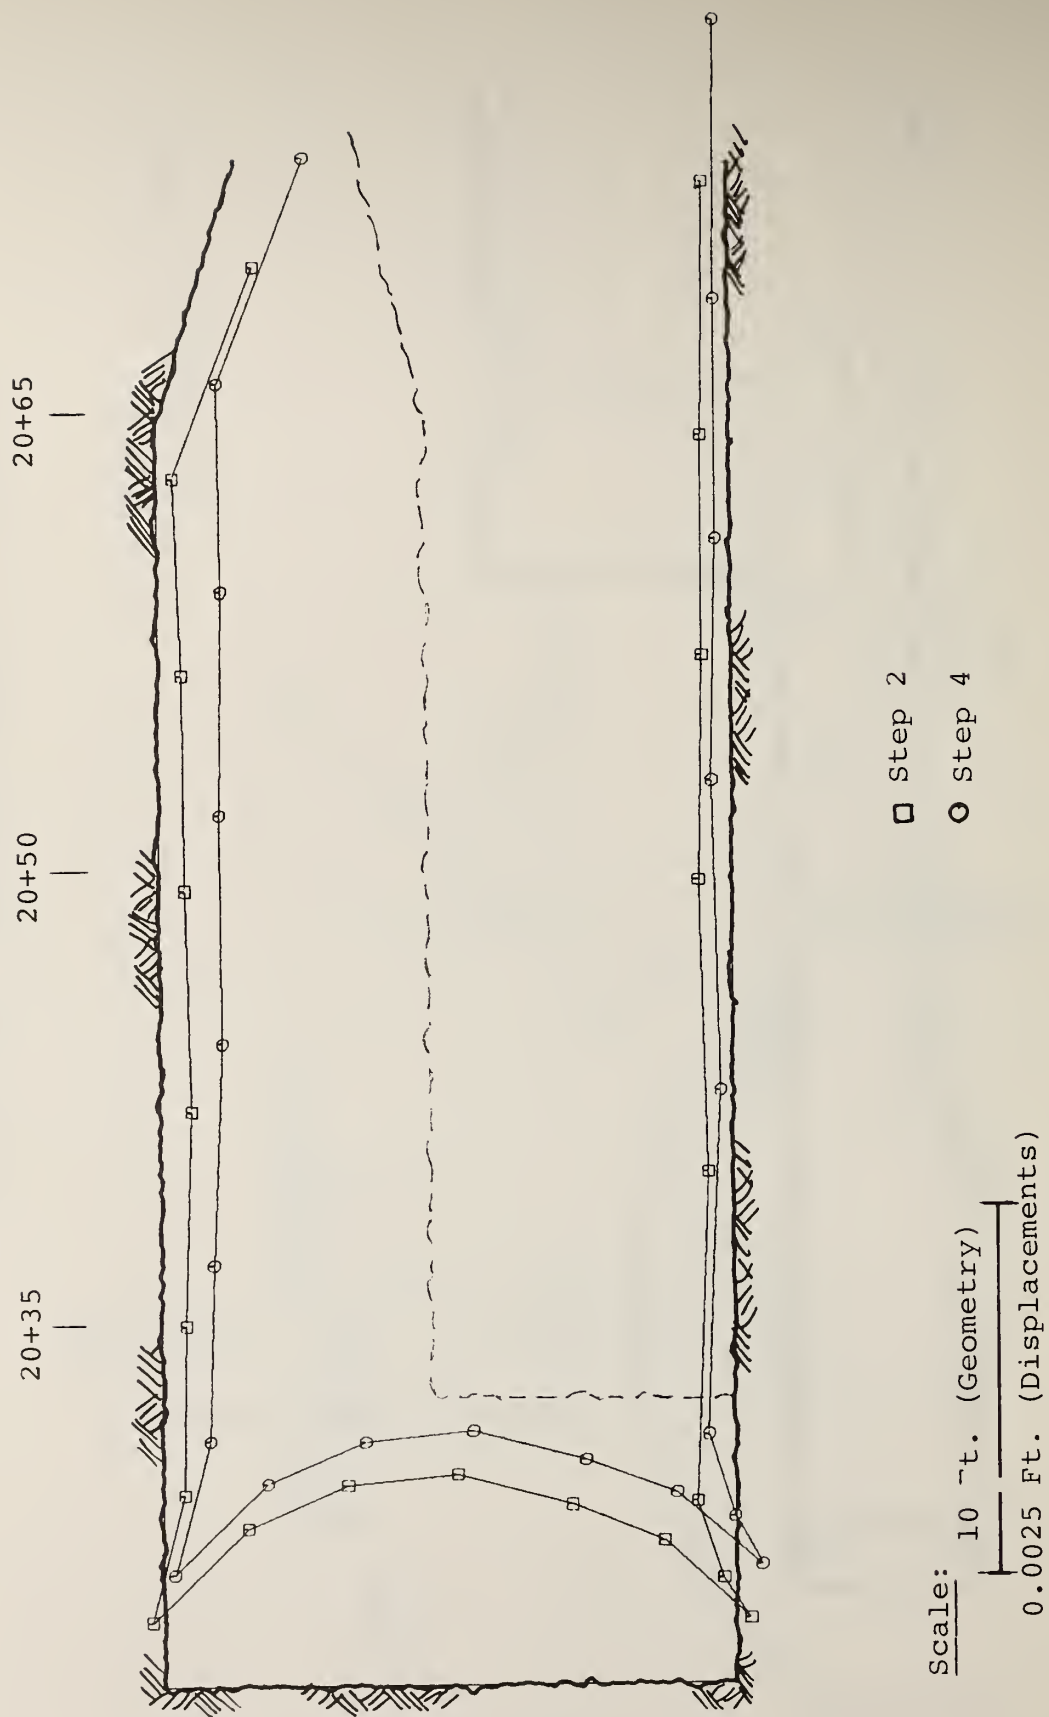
DEFORMED GEOMETRY OF OPENINGS
